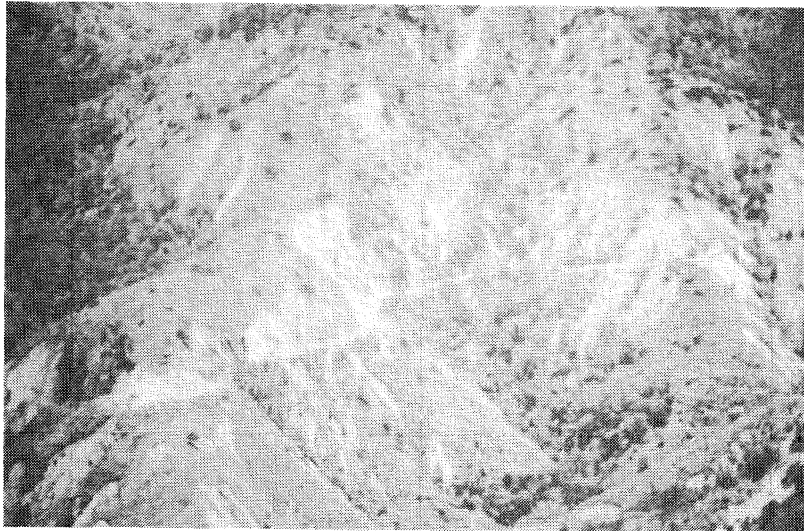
Landslides in mountains north of Baguio blocking road to Ambuklao hydroelectric plant and villages
